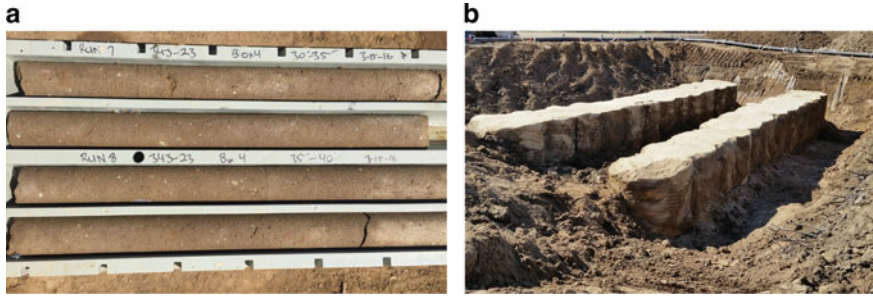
a DMM Core runs b Exposed DMM test panels at Perris Dam site
